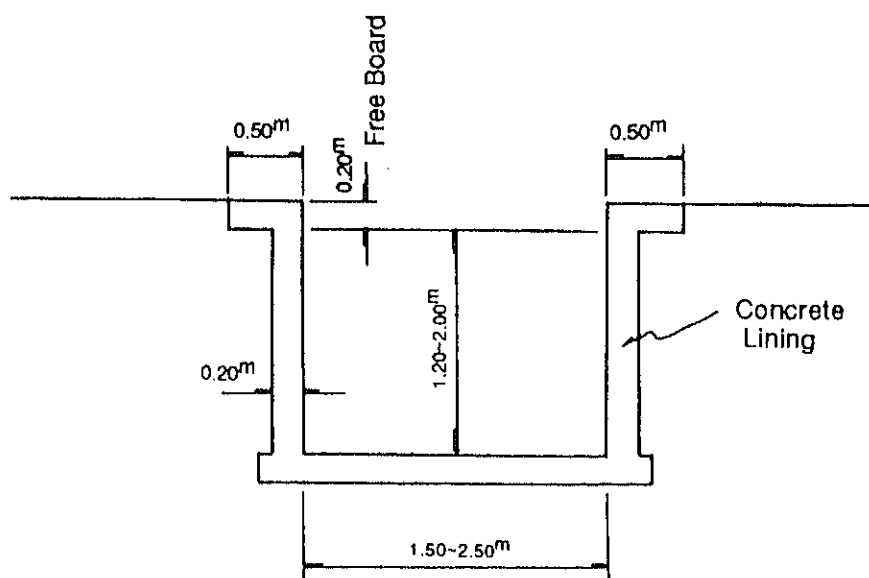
PROPOSED CROSS SECTION OF DRAINAGE CHANNEL (1)
